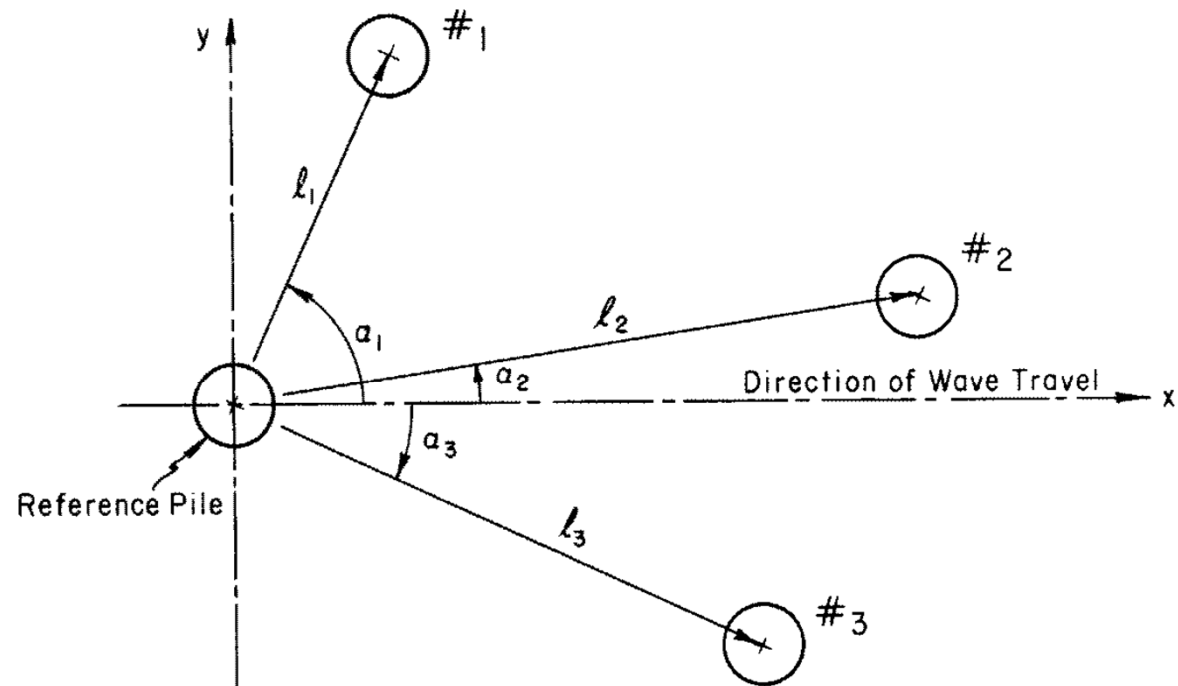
Definition sketch: calculation of wave forces on a group of piles that are structurally connected.
